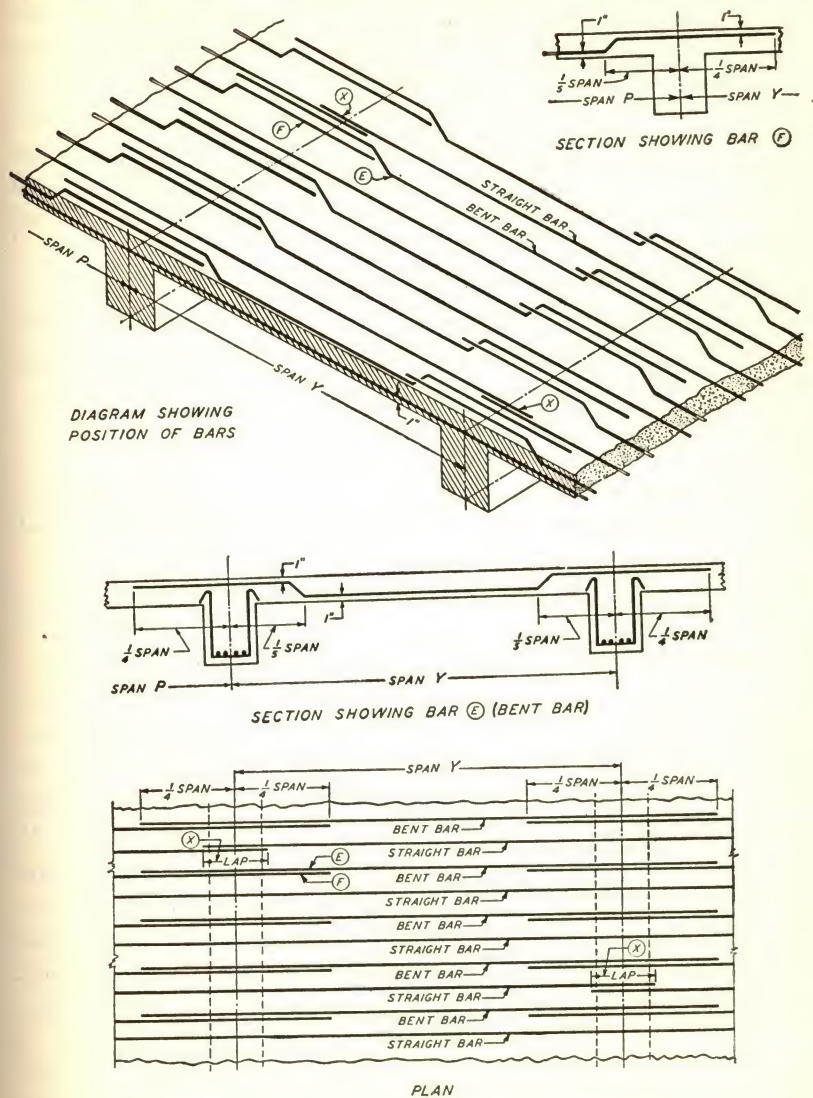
A. Detail of Slab in Reinforced Concrete Construction
